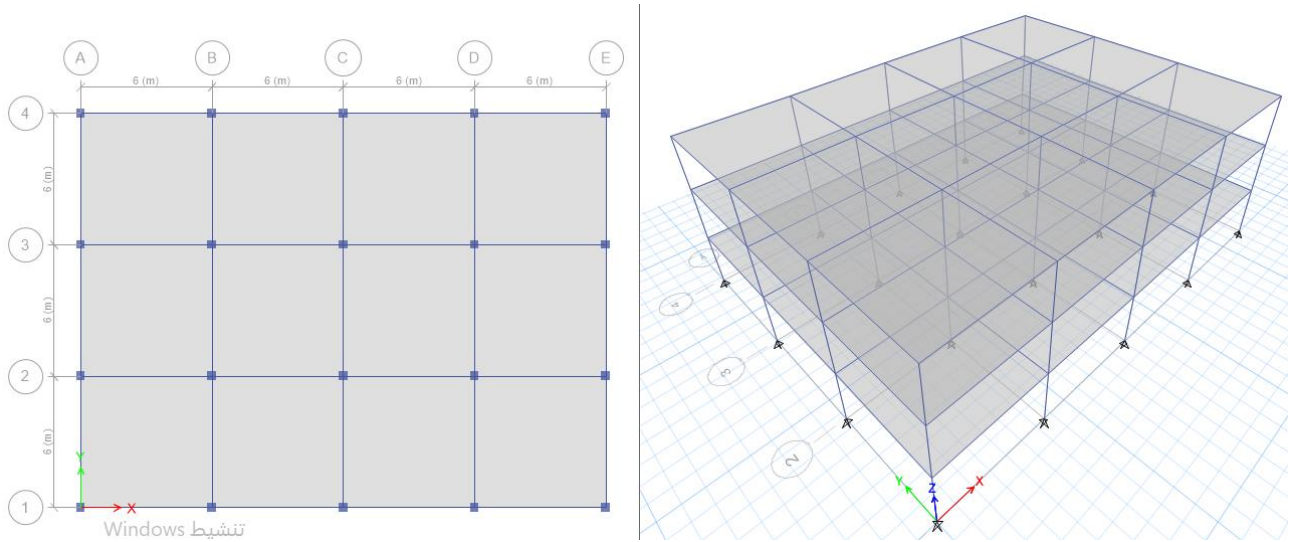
The Dimension and The Layout of the Three - Story Structure Building (Frames).
